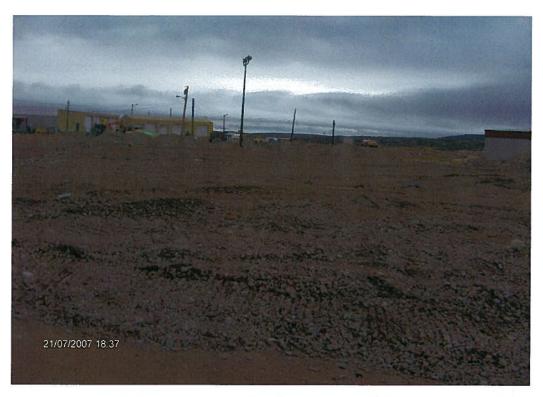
View of Fuel Re-Supply excavation. Note fuel re-supply station. Photo taken facing west.
